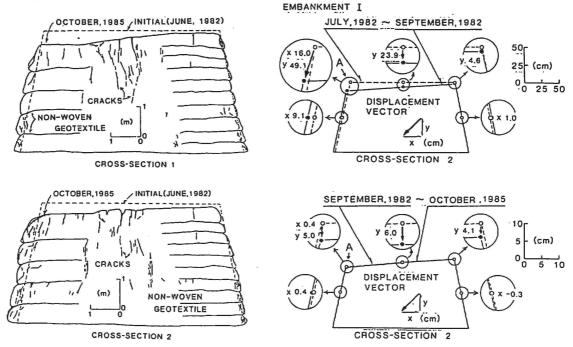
Two exposed cross-sections of Chiba No. 1 embankment.
